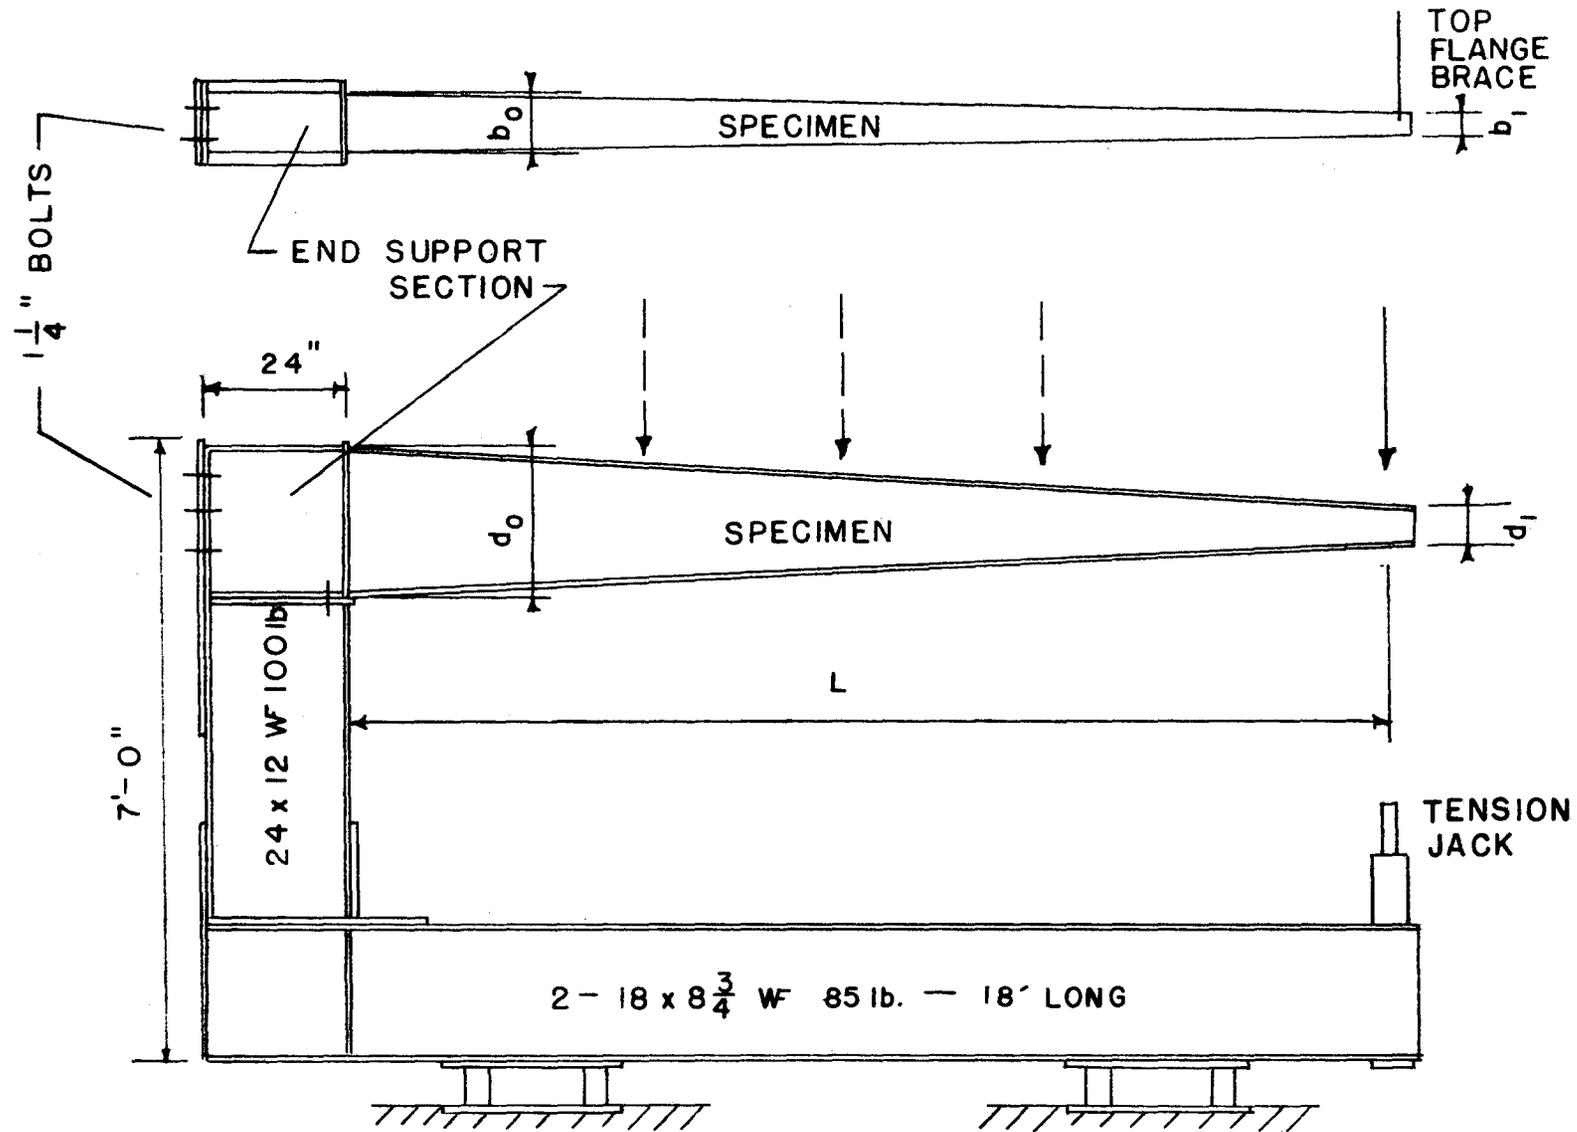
KREFELD *et. al.*⁴ TESTING ASSEMBLY
